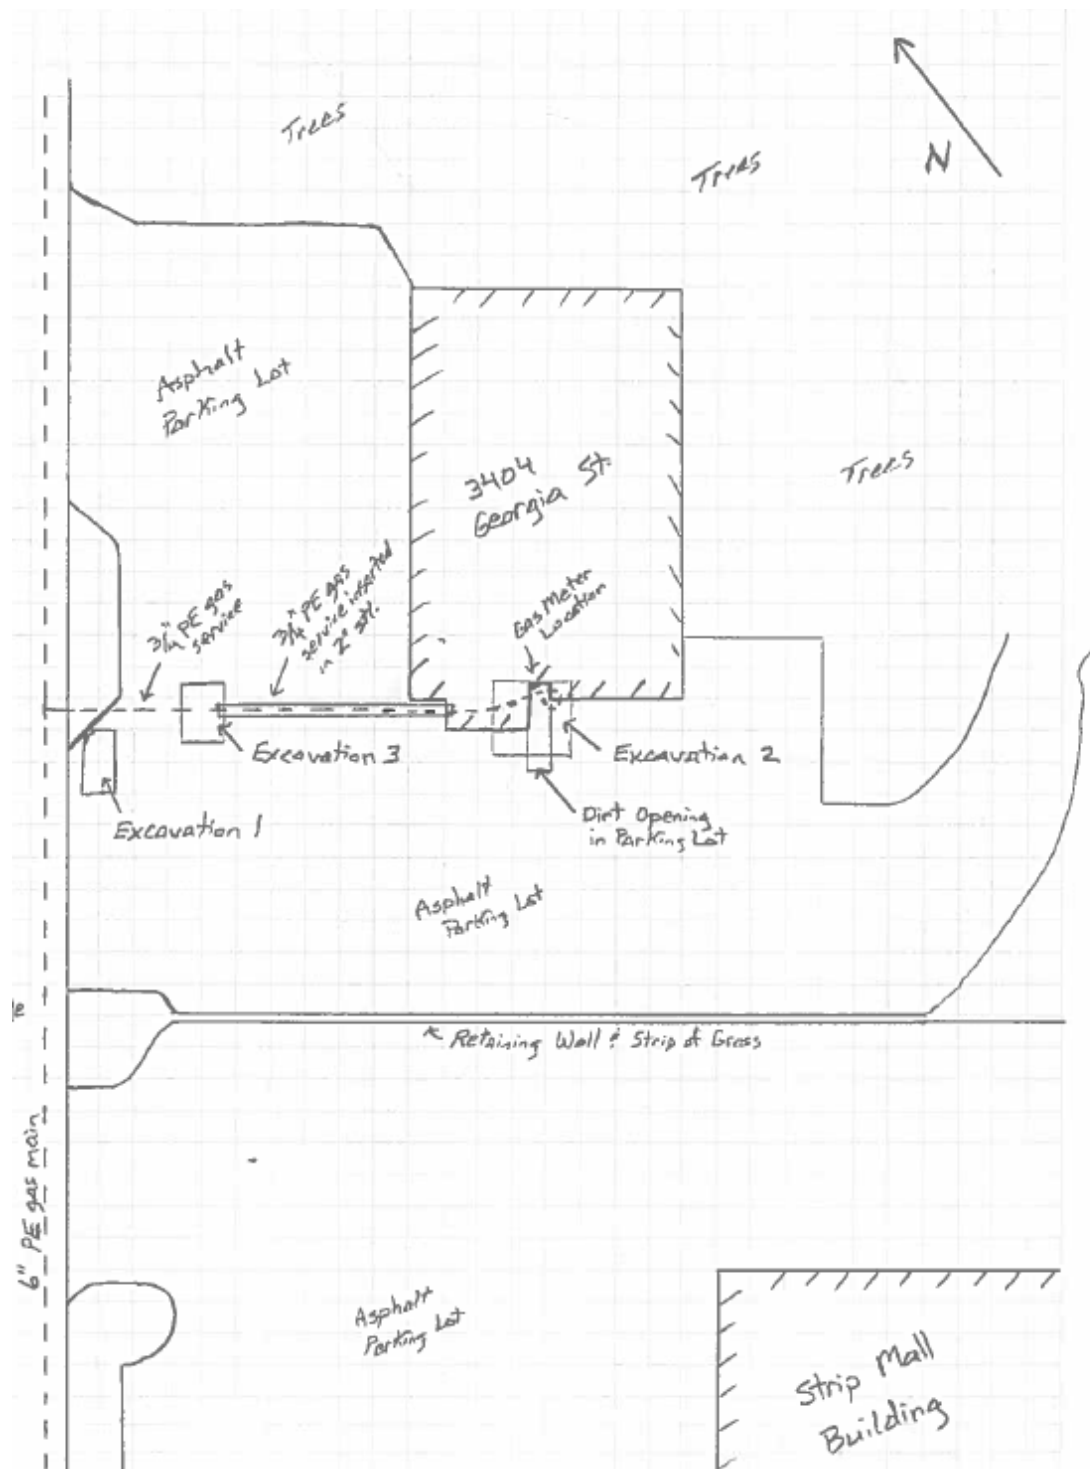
Ameren's sketch of 3404 Georgia Street Plan View. The areas labeled "Excavation 1", "Excavation 2" and "Excavation 3" refer to excavations Ameren made subsequent to the incident. (Source: GS-2016-0159, Ameren's response to Staff data request 0001). Note this sketch does not show the 6-inch to 8-inch transition on the main. At the location where the 3/4-inch PE gas service line connects to the main, the main is 8-inch.
